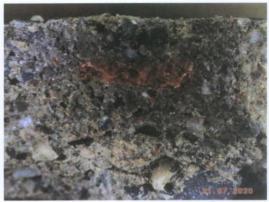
Cross-section of the 1959 Portland Cement render on the east wall of No.10 Henry Place.
